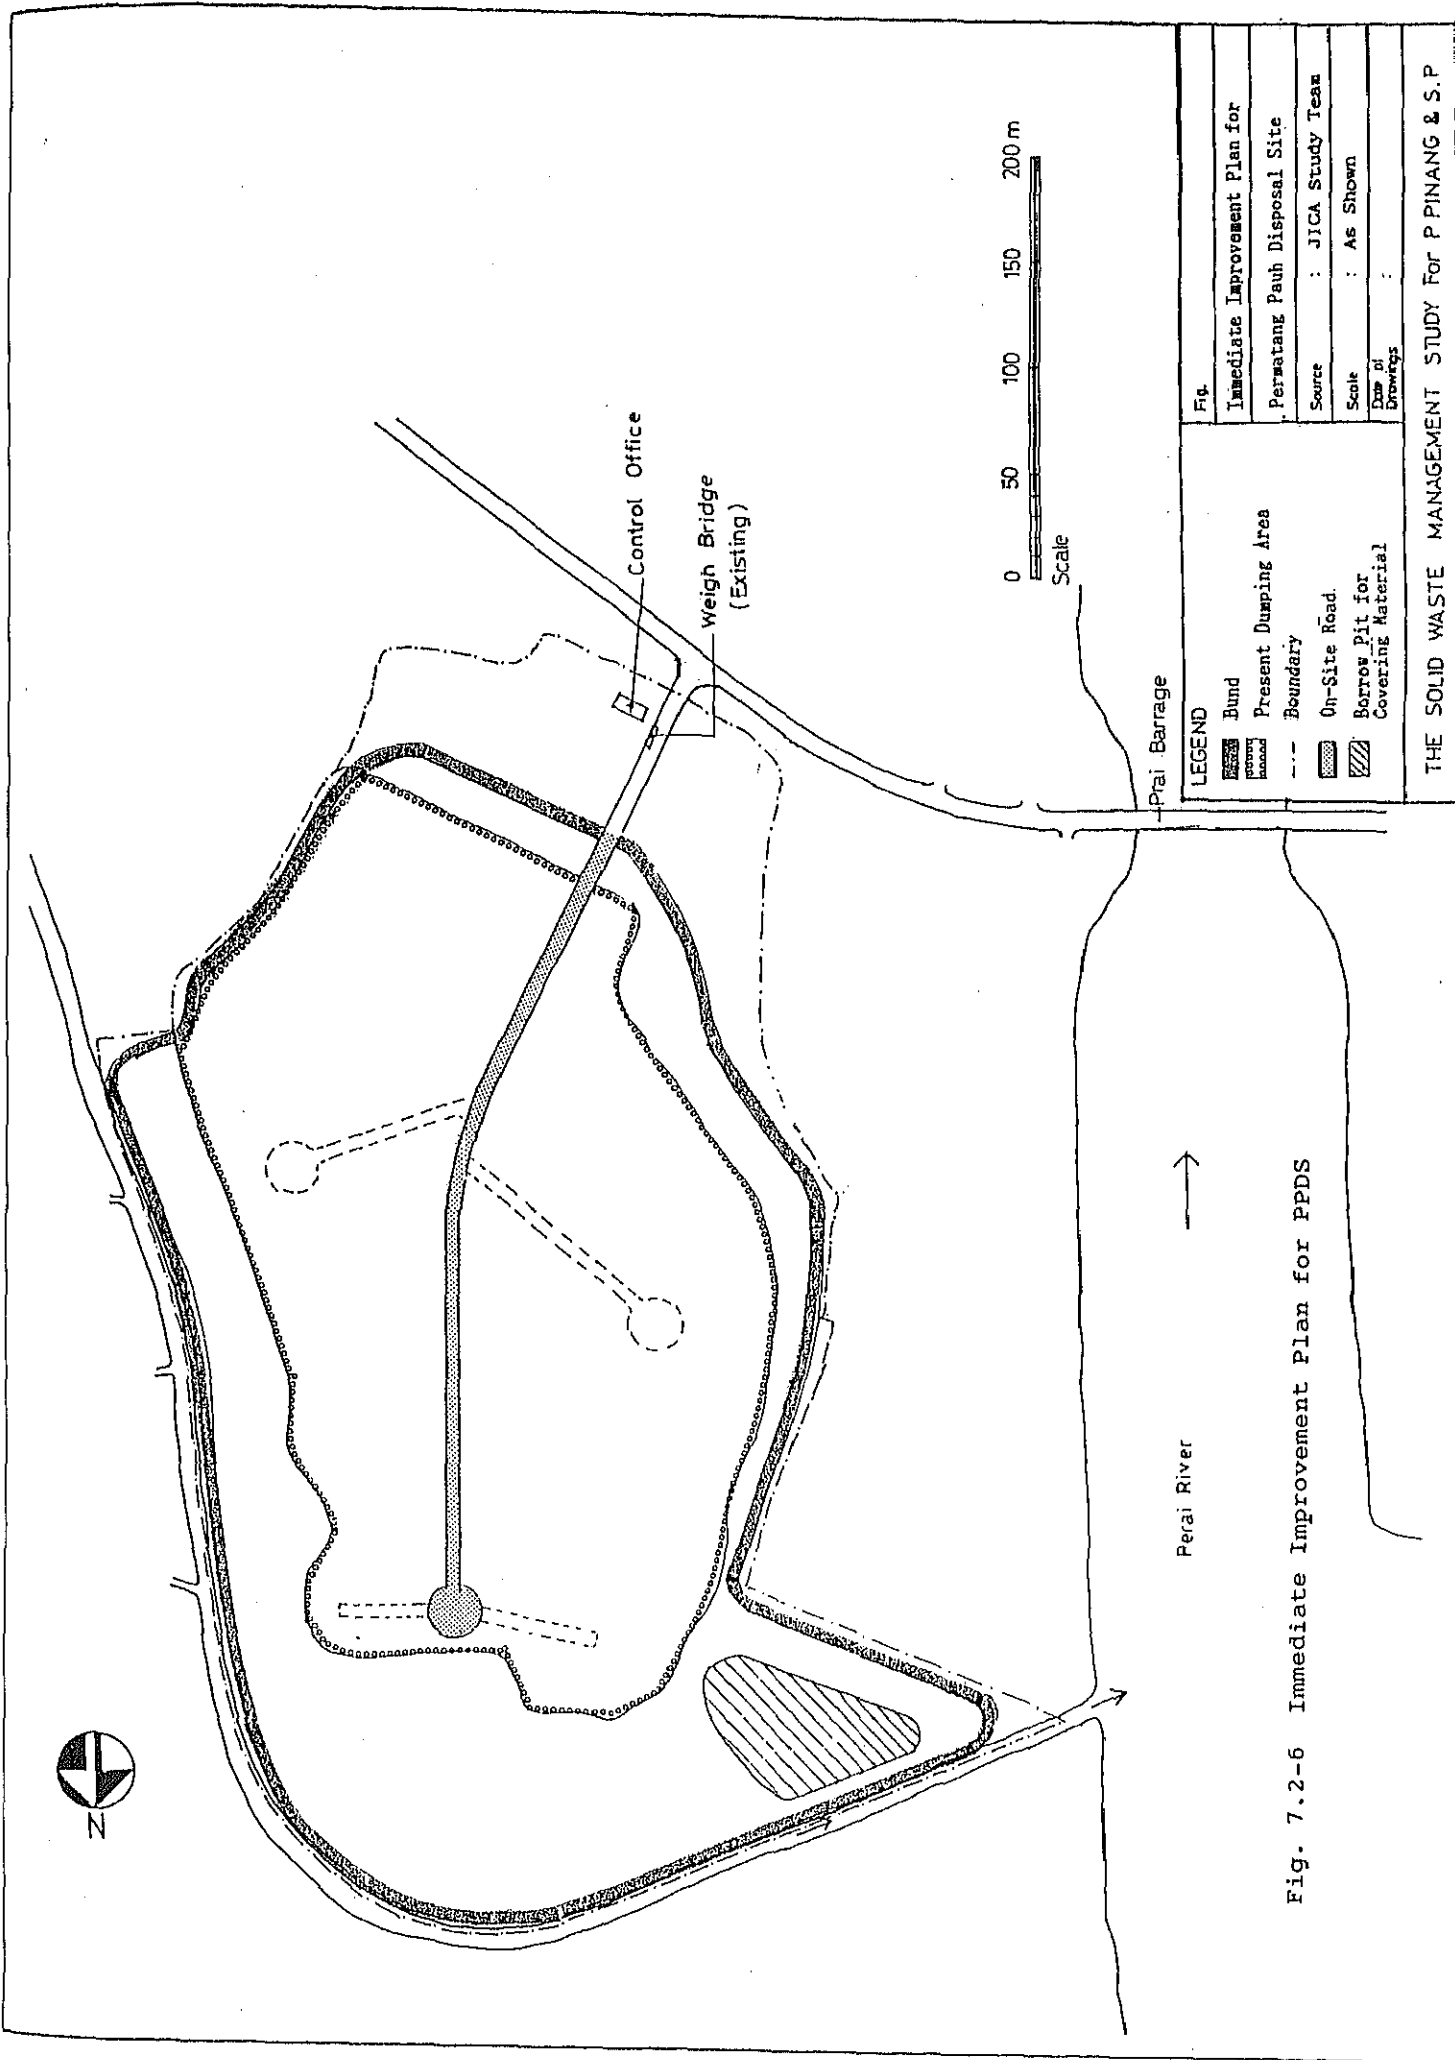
Immediate Improvement Plan for PPDS
